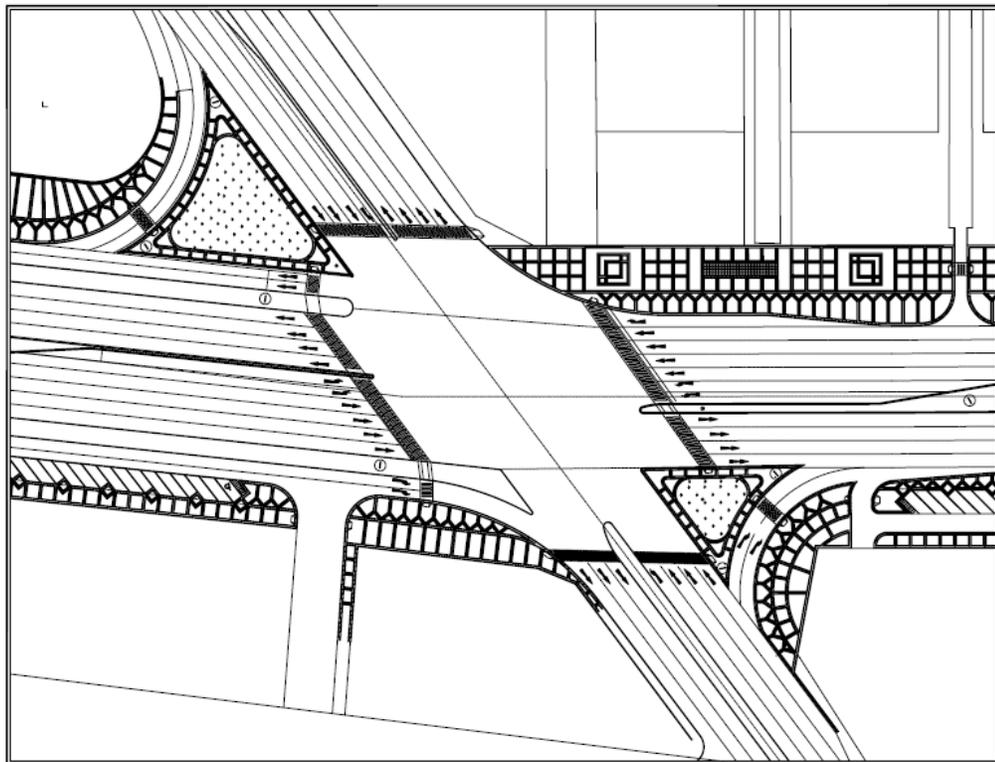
Intersection-3 King Abdullah- King Fahd road (Olba, 2007)
